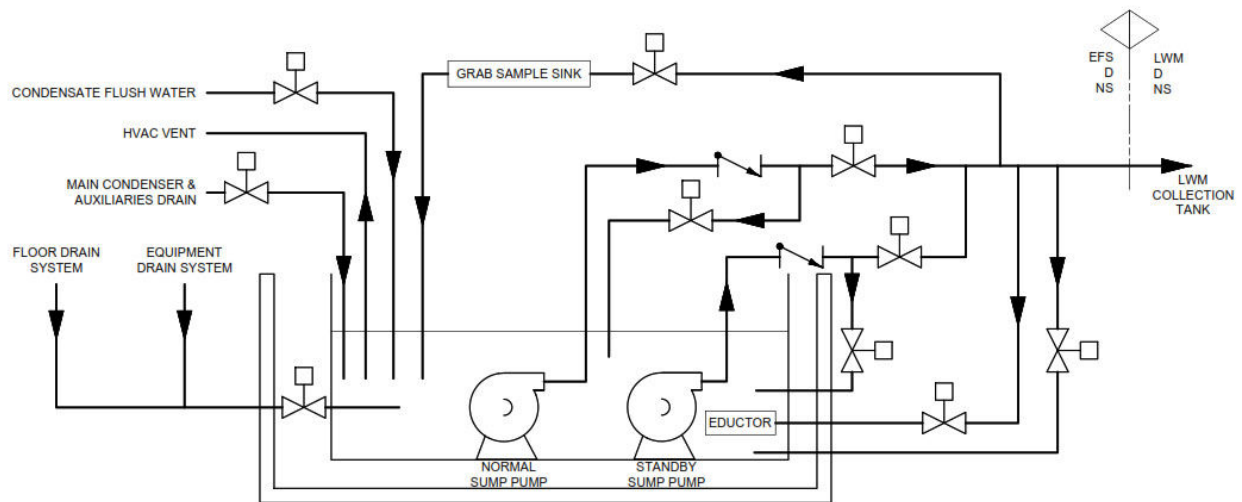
A.9.3-1a: Floor Drain System Drain Sump (Typical)
